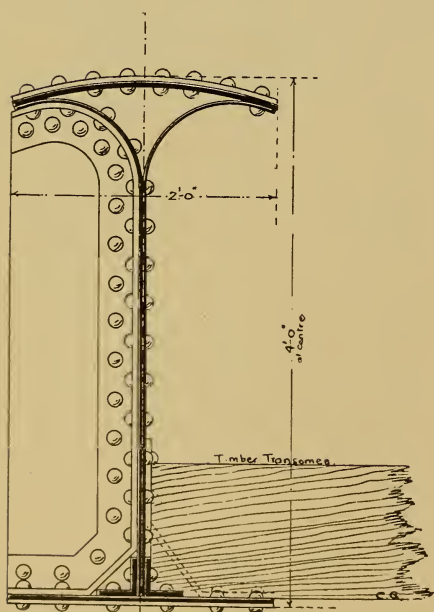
GIRDER FOR BRIDGE OVER STAINDROP ROAD, NEAR DARLINGTON. SPAN 53 FEET. SIR THOS. BOUCH ENGINEER, 1856
